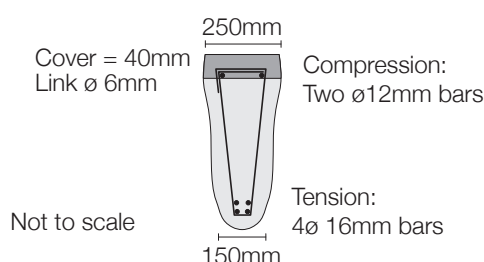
Cross section and reinforcement layouts assumed in design process.
